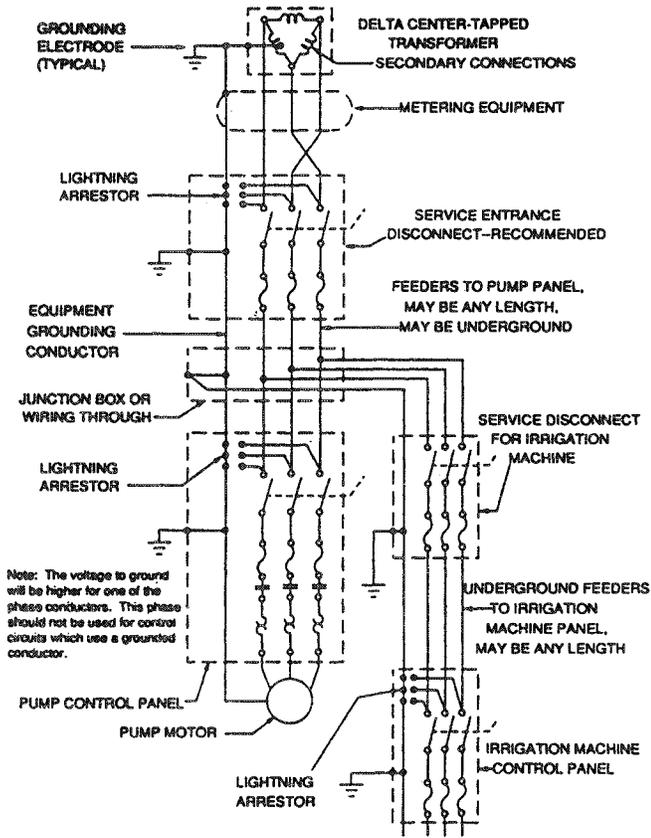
Recommended equipment and grounding for delta center-tapped transformer secondary connections
